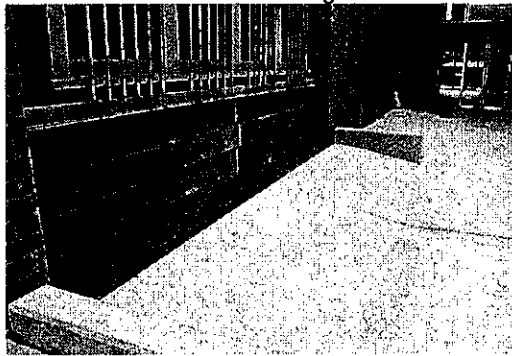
Exterior, Exchange Hall, detail of ramped concrete ground level adjacent to the introduced windows and wall cladding on the east elevation. Also note the space between the introduced concrete ramp and the wall base.
